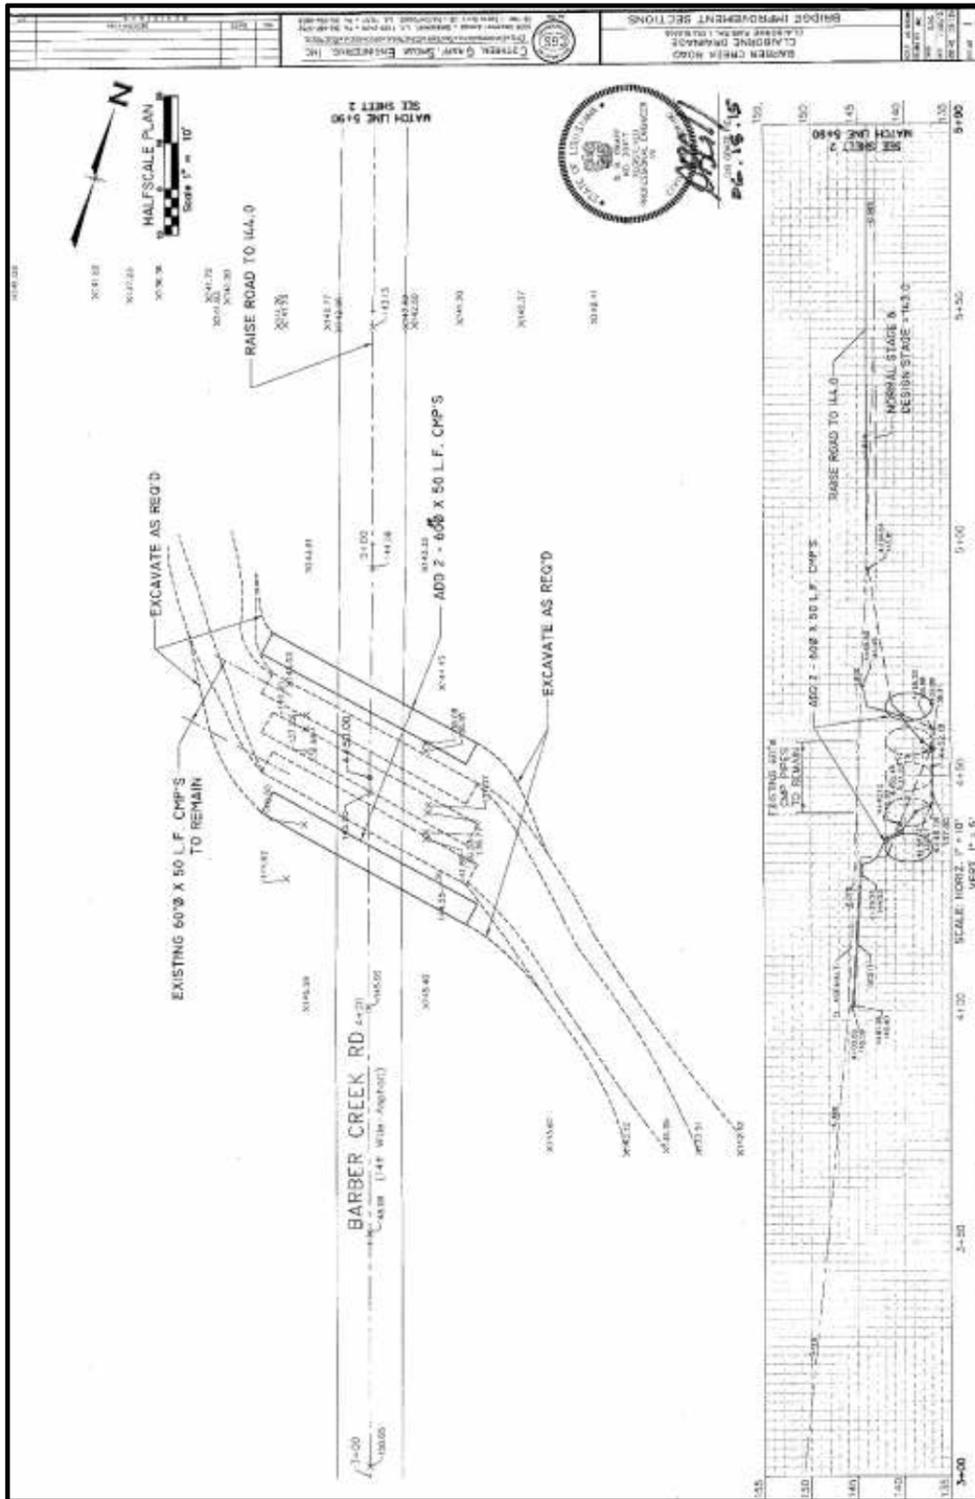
Construction plans for the proposed Barber Creek Road Bridge in PA 1 (Part 1 of 4) (Cothren, Graff, Smoak Engineering, Inc. 6/15/15).
